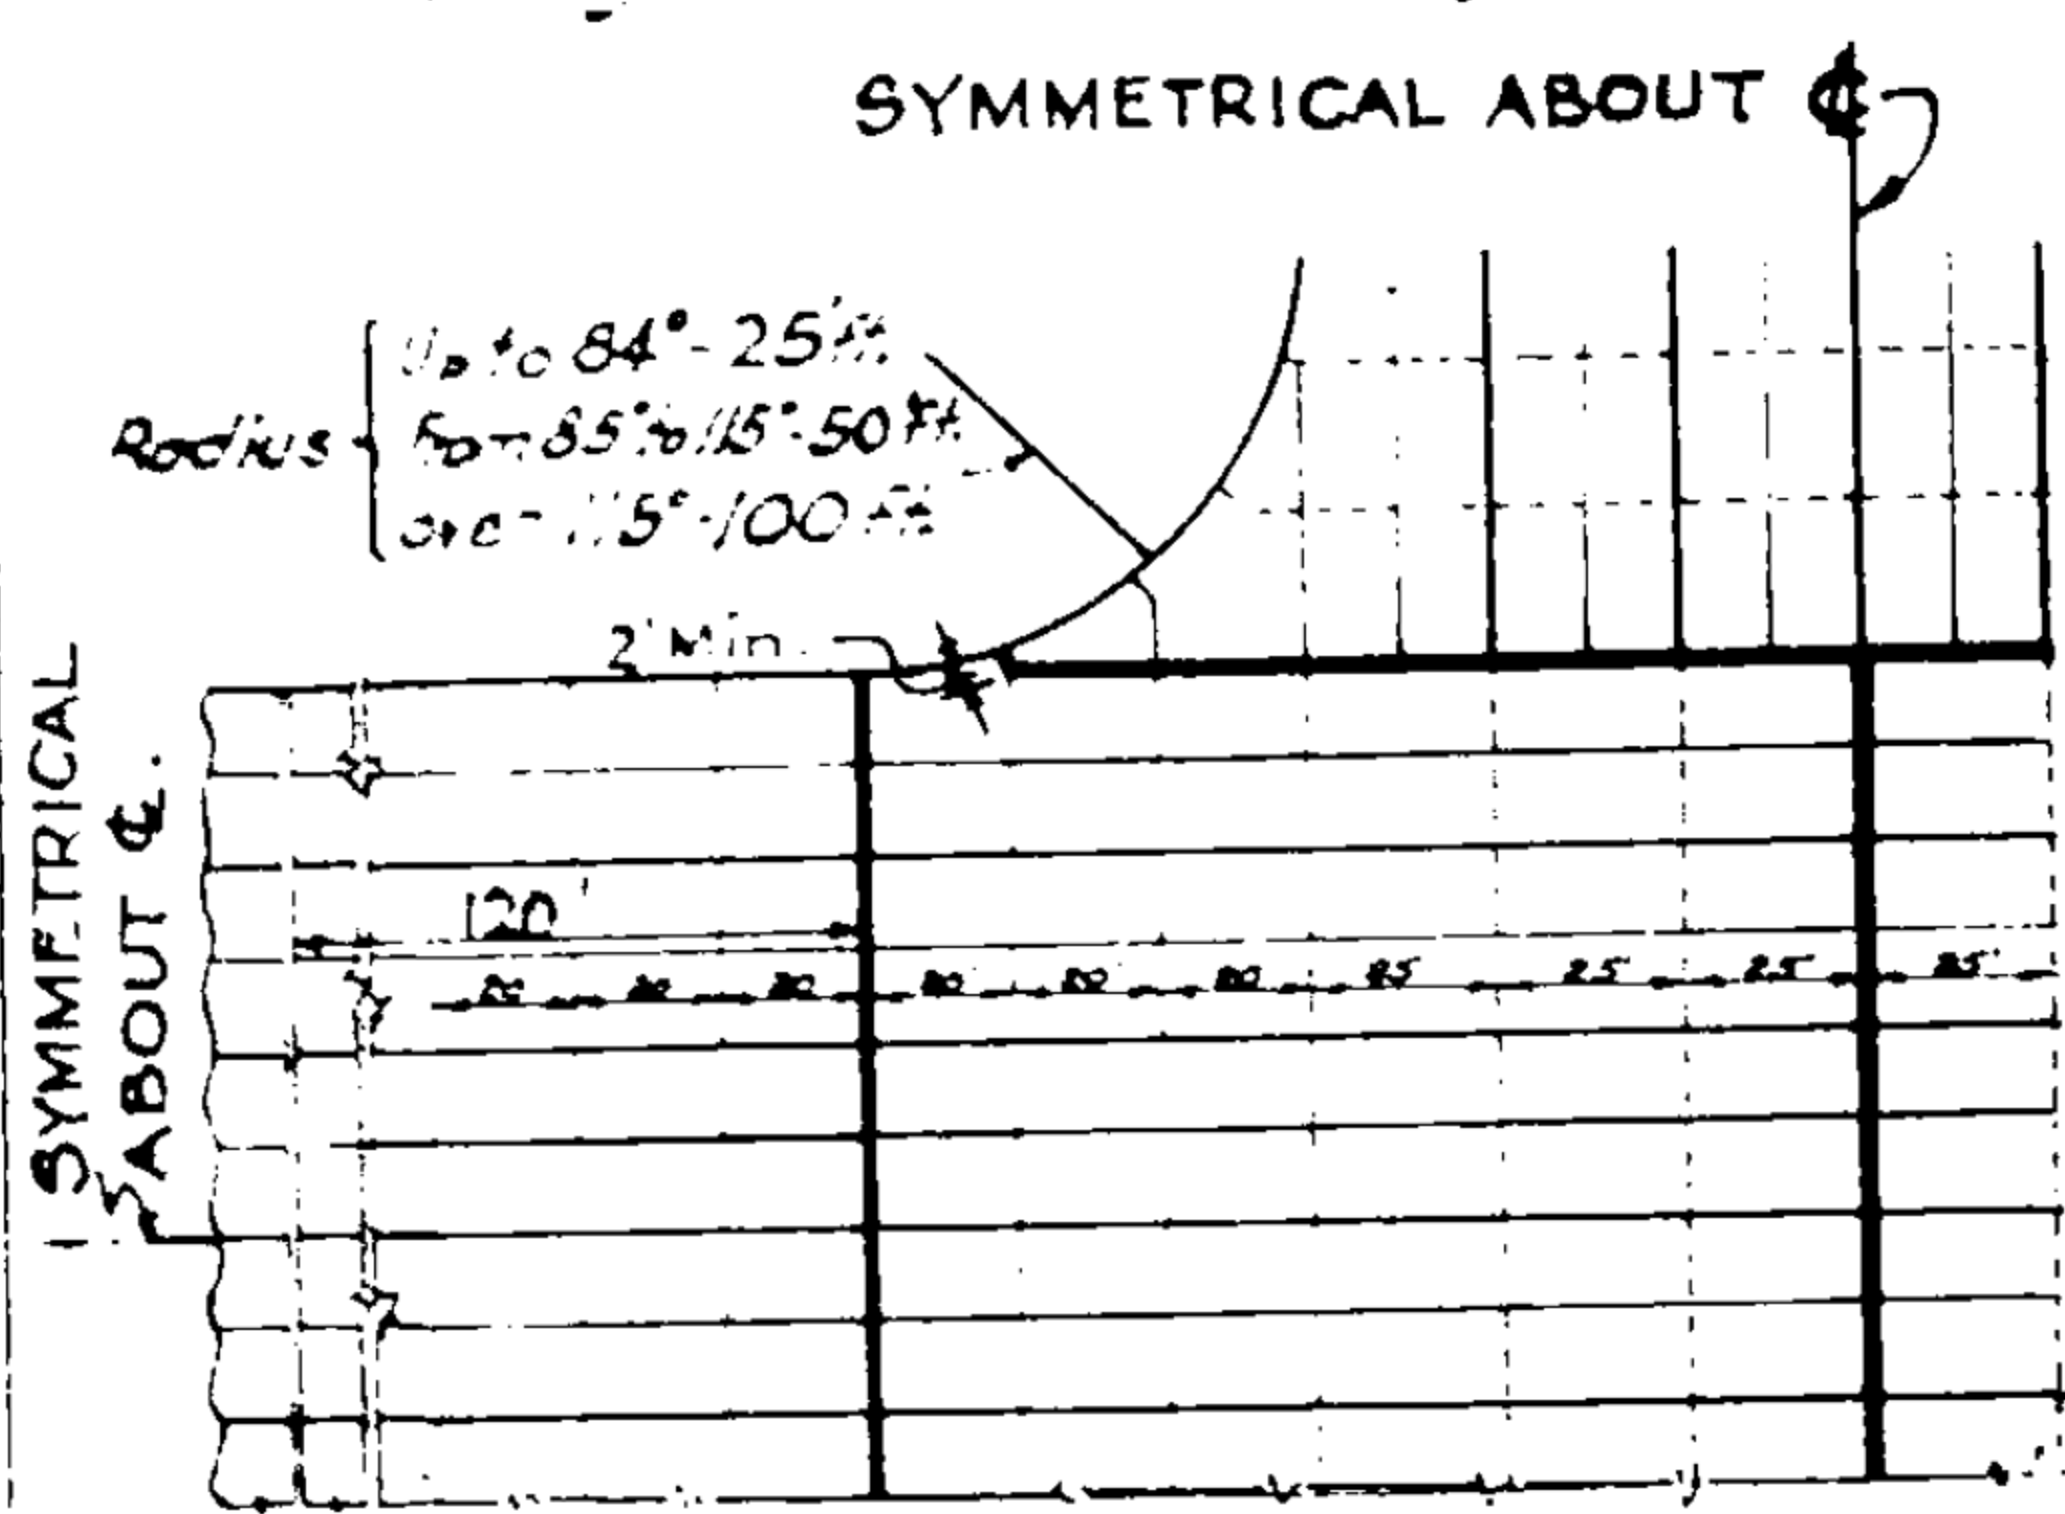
/4 JOINTING PLAN RUNWAYS AT RIGHT ANGLES.
